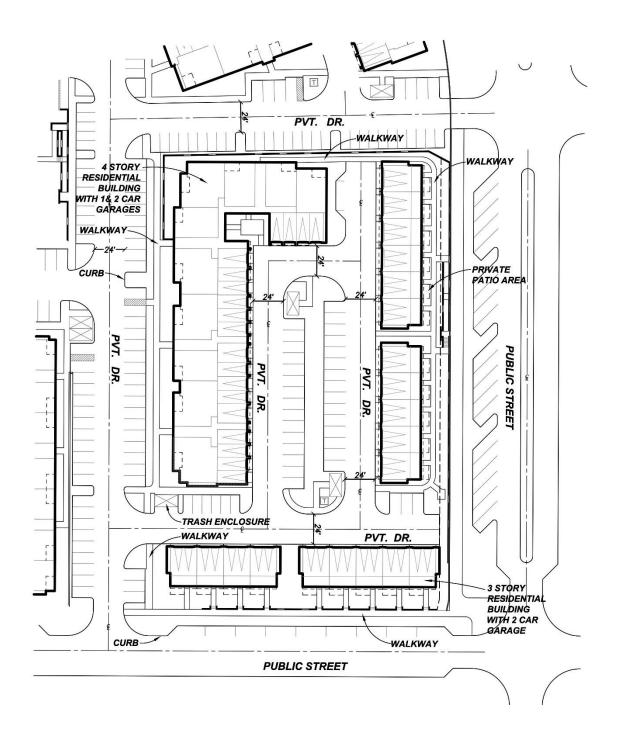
Typical Three/Four-Story Flats and Townhome Plotting
